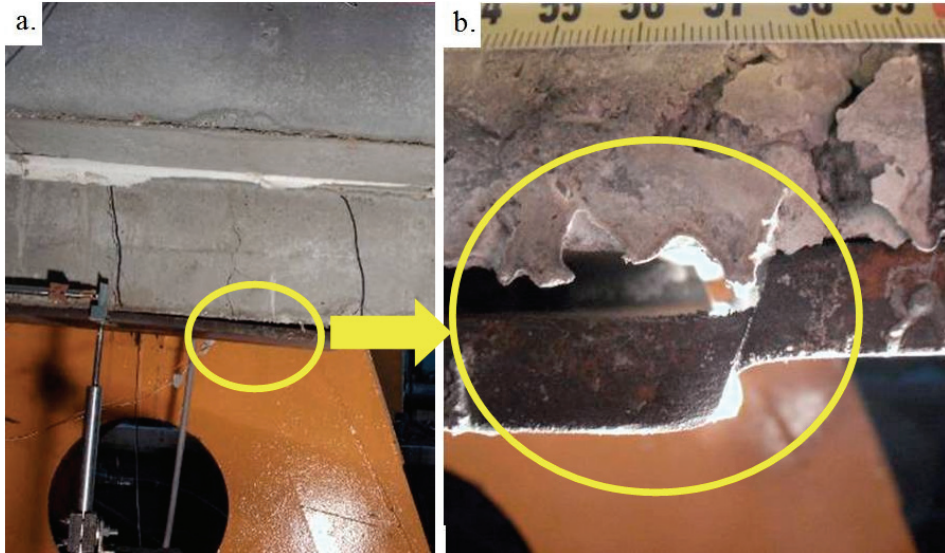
a) Place where flange was cracked, b) Zoom into crack zone
